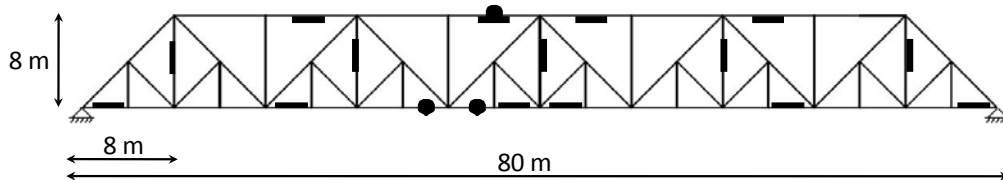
A truss structure of a 80-m railway bridge with sensor locations marked as black bars and damage locations marked as black dots.
